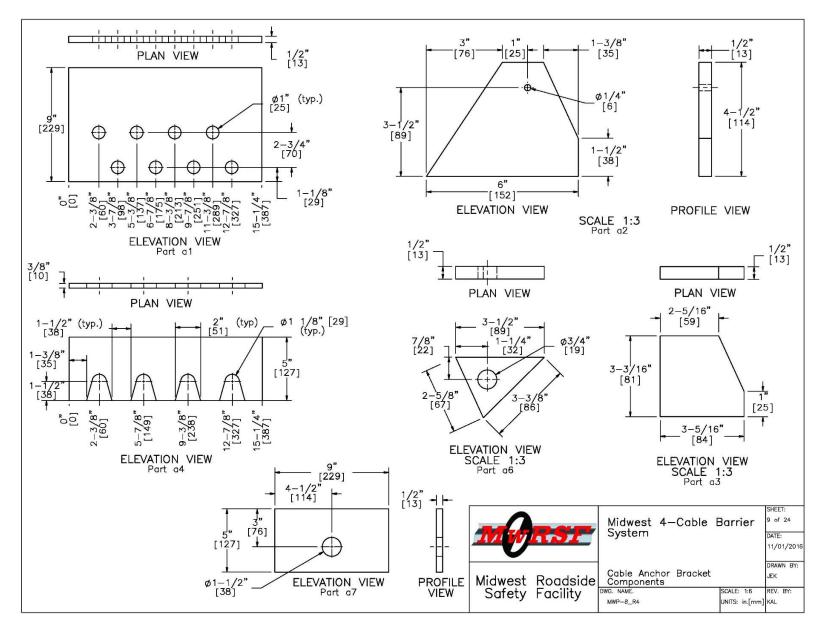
Cable Anchor Bracket Components, Test No. MWP-8
